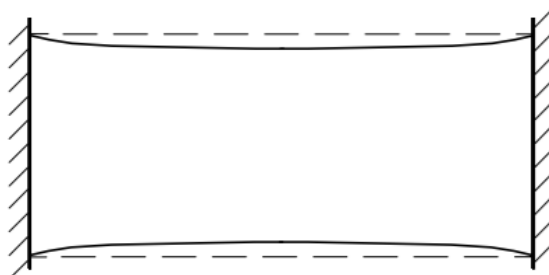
Slab element that is attached to structural members at the shorter ends (Engström, *Restraint cracking of reinforced concrete structures*, 2014).
